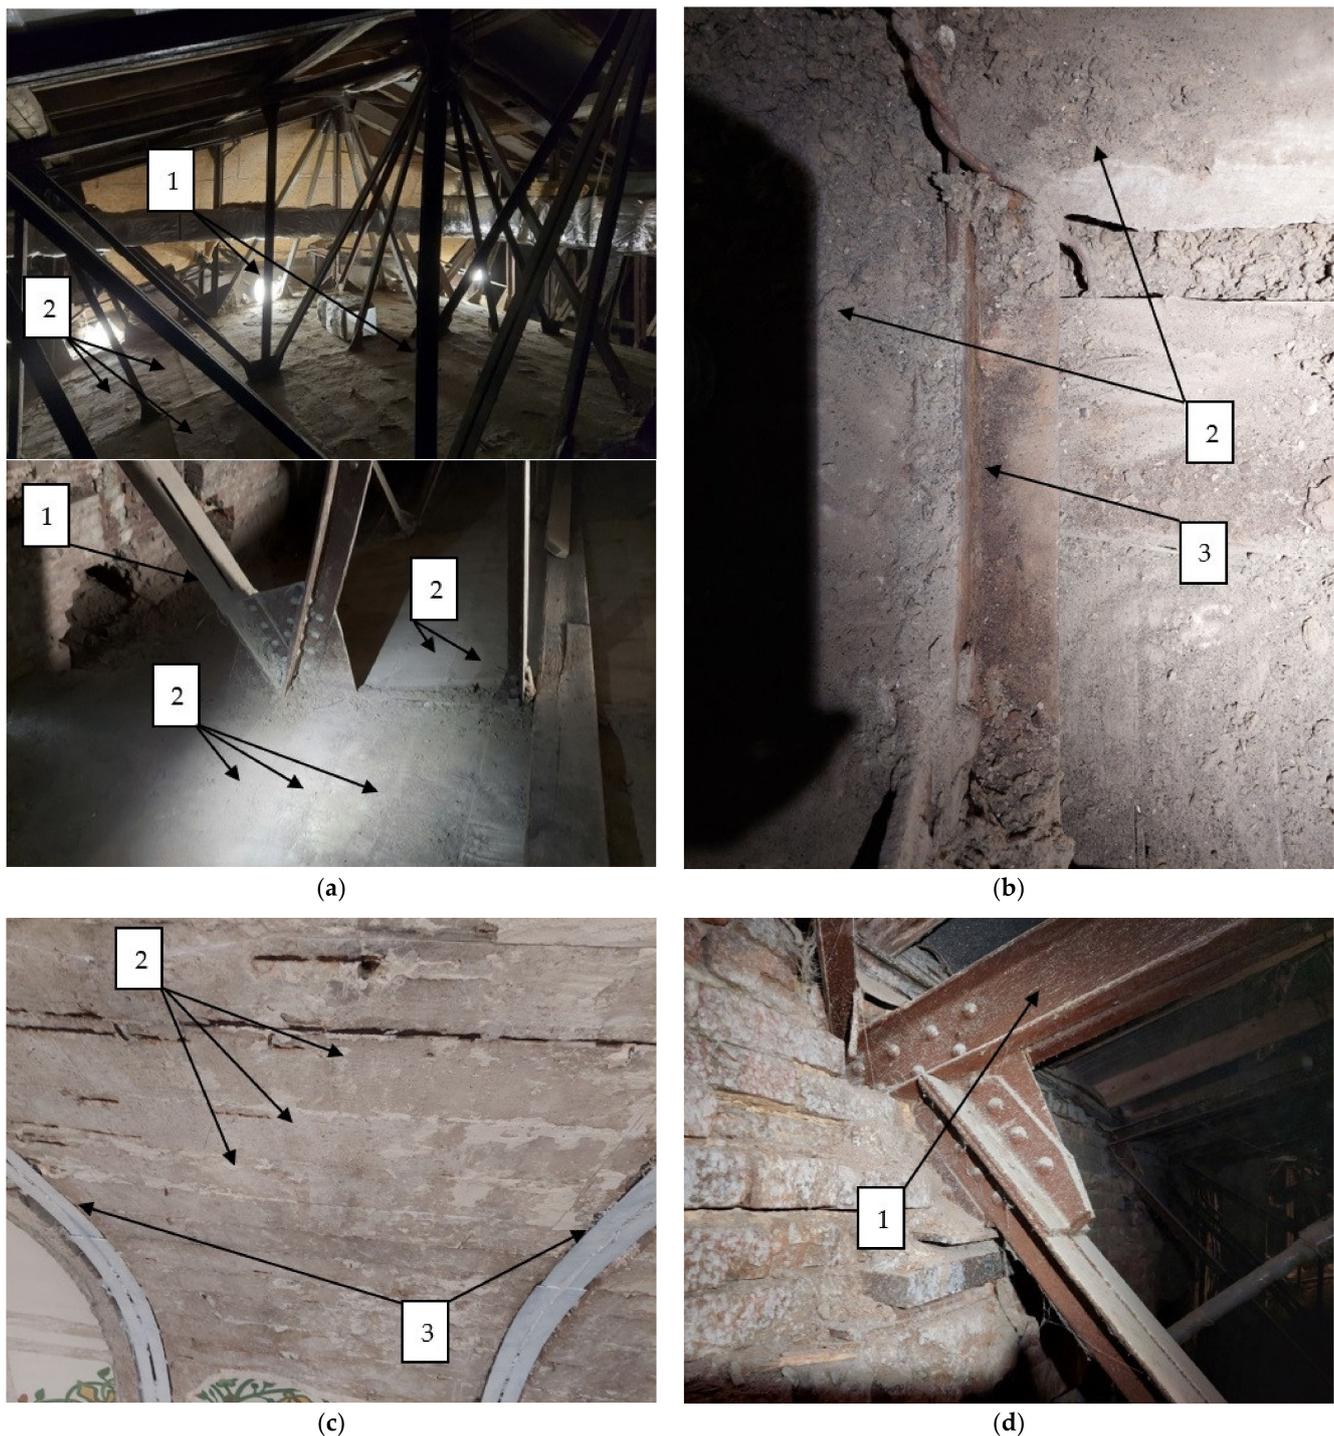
Construction of the attic ceiling: (a) general view of the steel roof trusses (1) and precast reinforced concrete elements (2) after cleaning the thermal insulation; (b) the bottom chord of the truss (3) which supports the precast reinforced concrete elements (2); (c) general view of the cover construction from below—precast reinforced concrete elements (2) are supported on the bottom chord of the steel truss (3) and form the vault of the hall; (d) the top chord of steel trusses is supported on the brick walls (source: authors).
